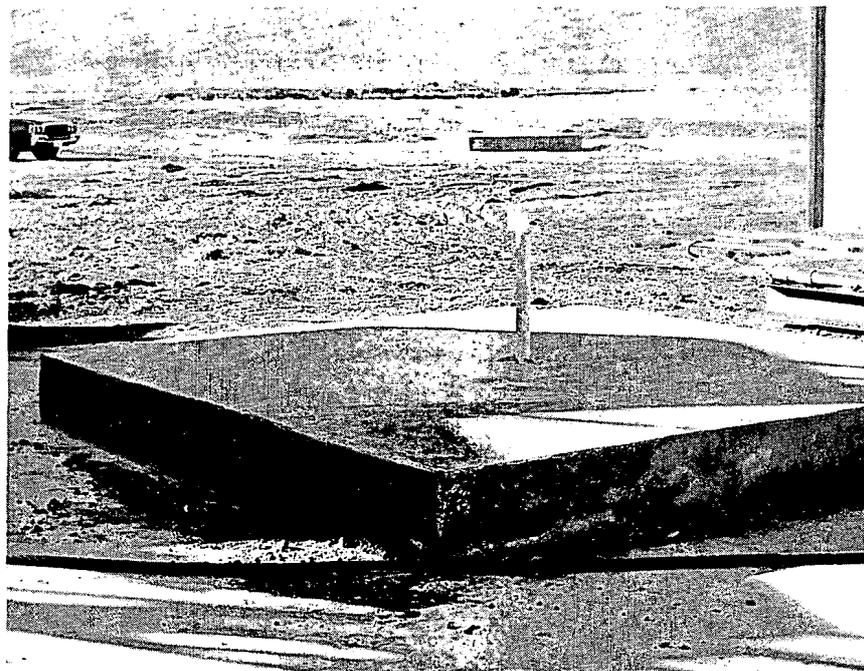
Concrete Cover Slab - UC-3 Cannister Hole
